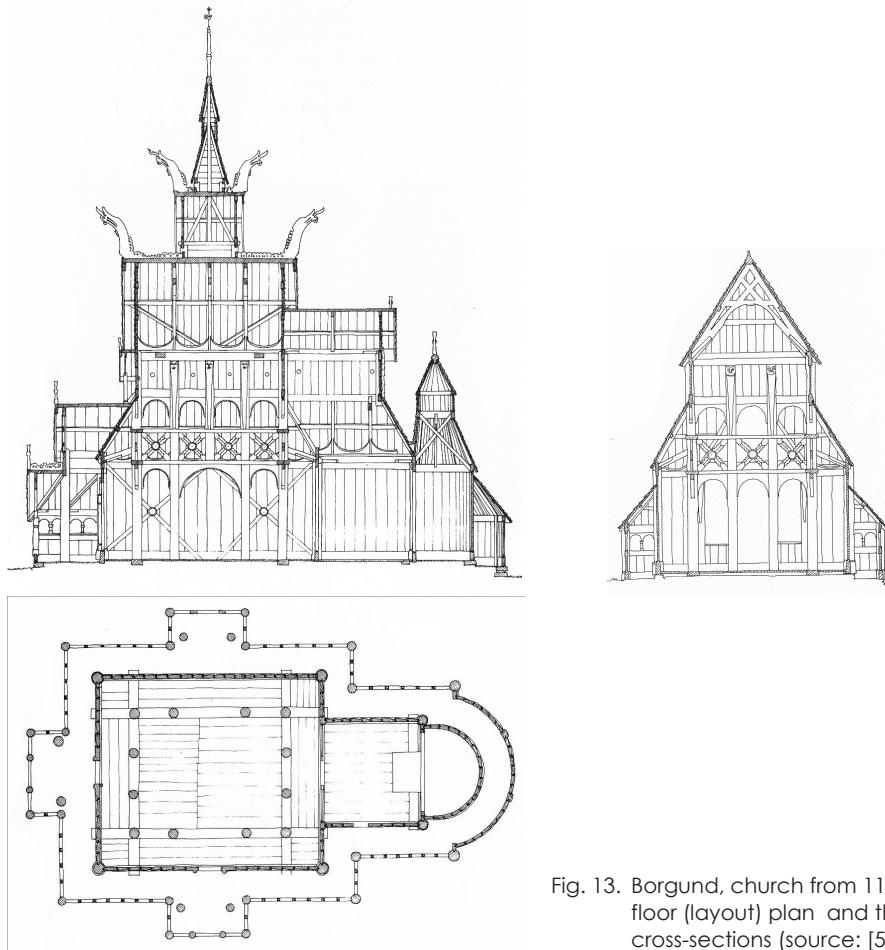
Borgund, church from 1150 – floor (layout) plan and the cross-sections (source: [5])
